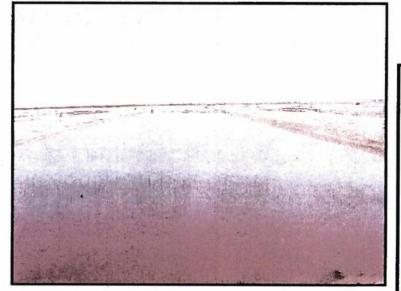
View of eighth row of impoundments looking southeasterly.
